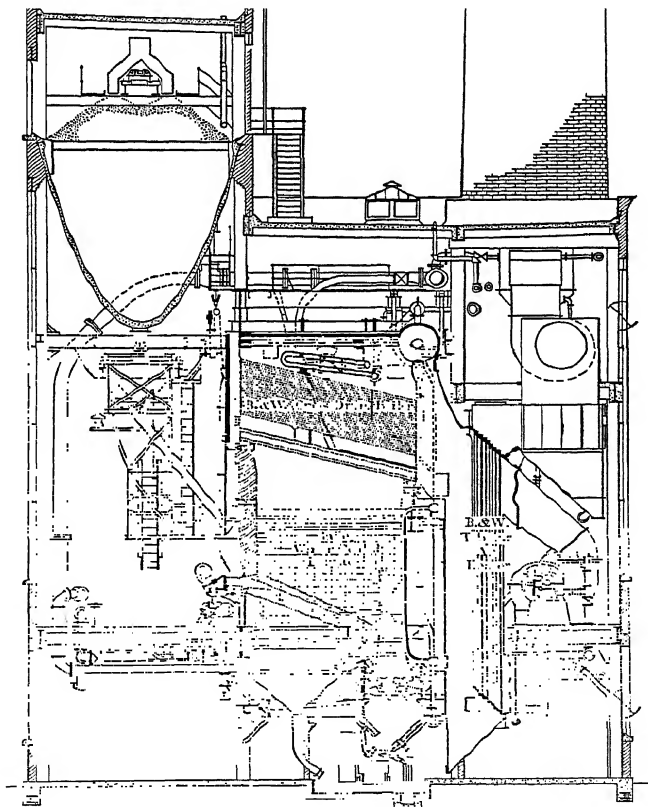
Babcock & Wilcox Boiler with Underfeed Stoker, Air Heater and Superheater
